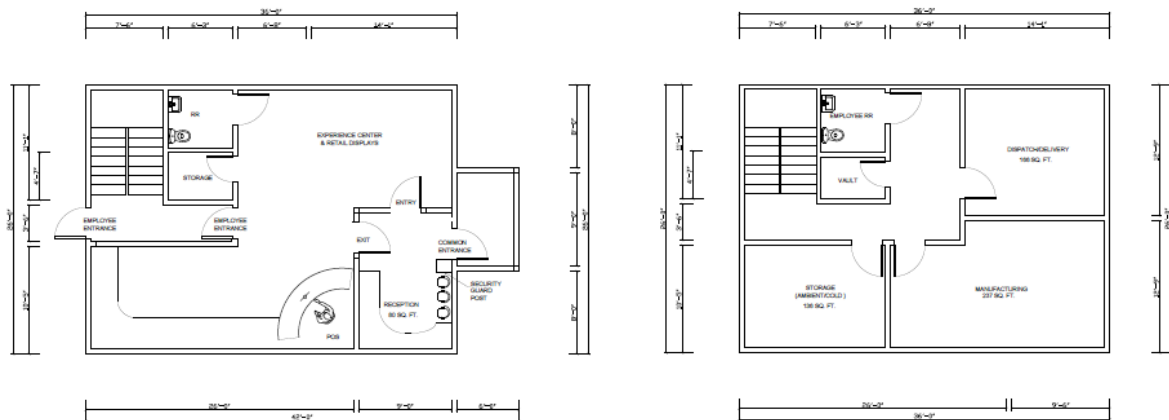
Proposed floor plans, as modified (Note: North is facing down in this orientation.)
